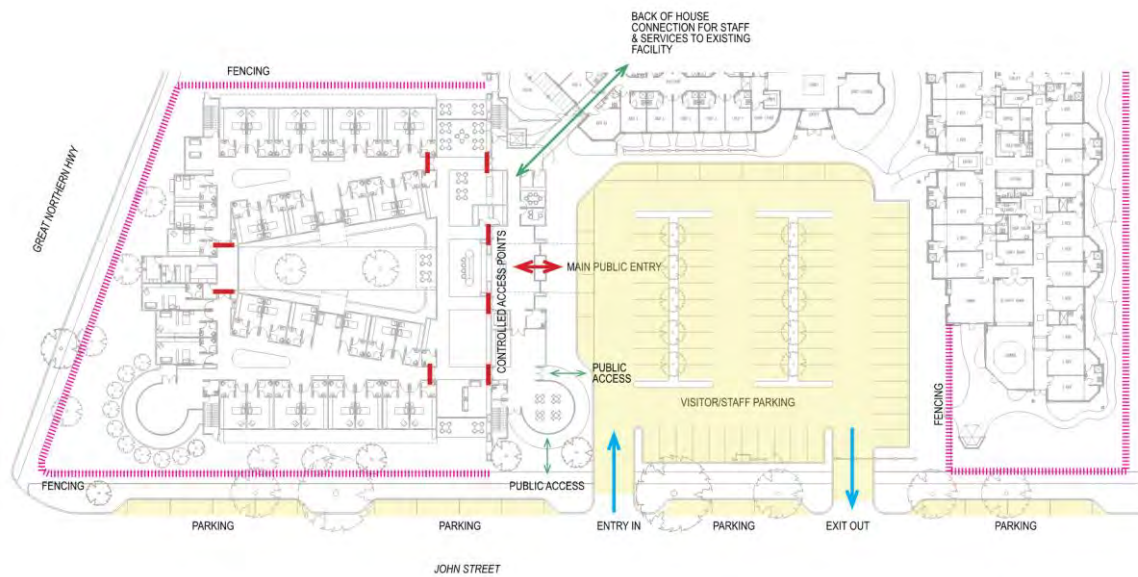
site plan diagram showing the public vs private spaces and the controlled access points
